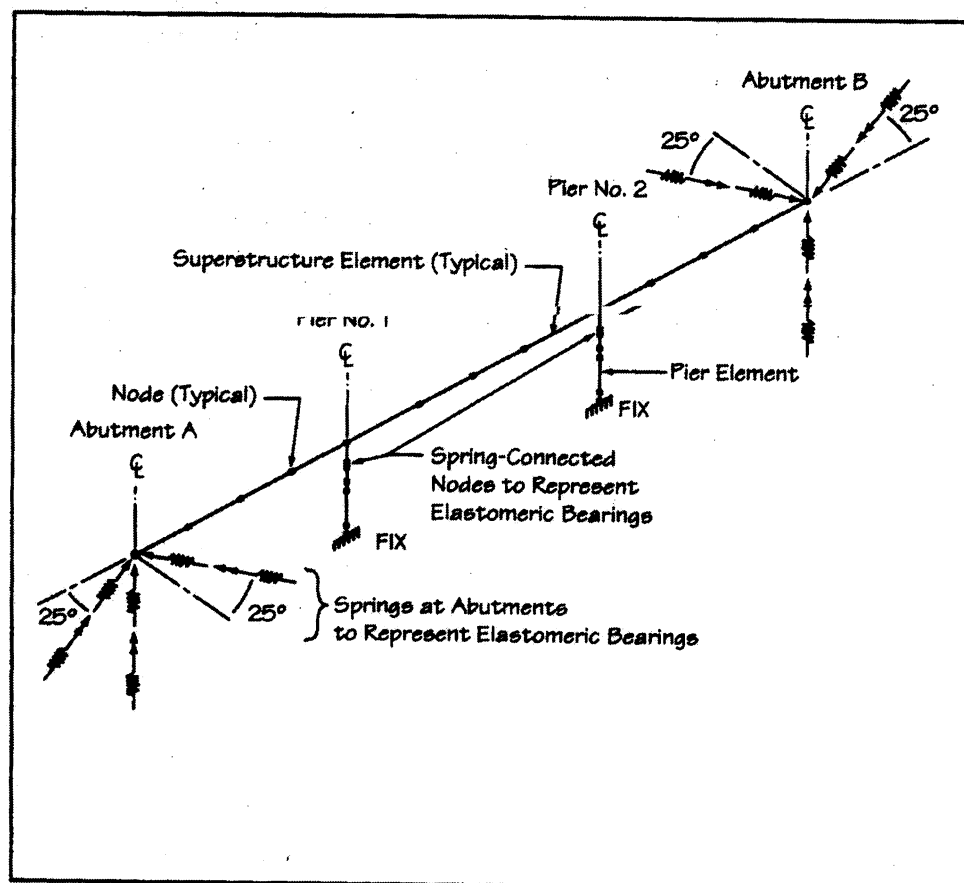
Bridge No. 2 - Finite Element Model
